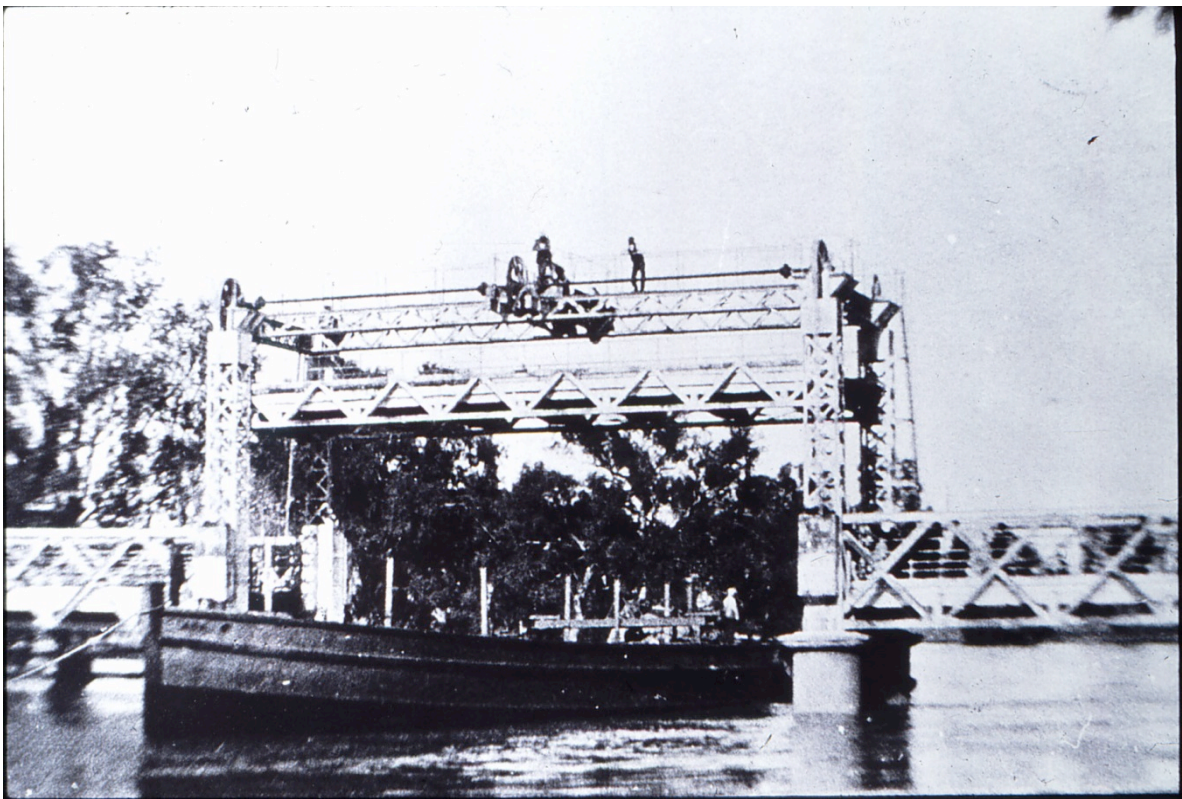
View of Wilcannia Bridge with lift span raised showing two operators on the tower, undated (Source: Mitchell Library)
